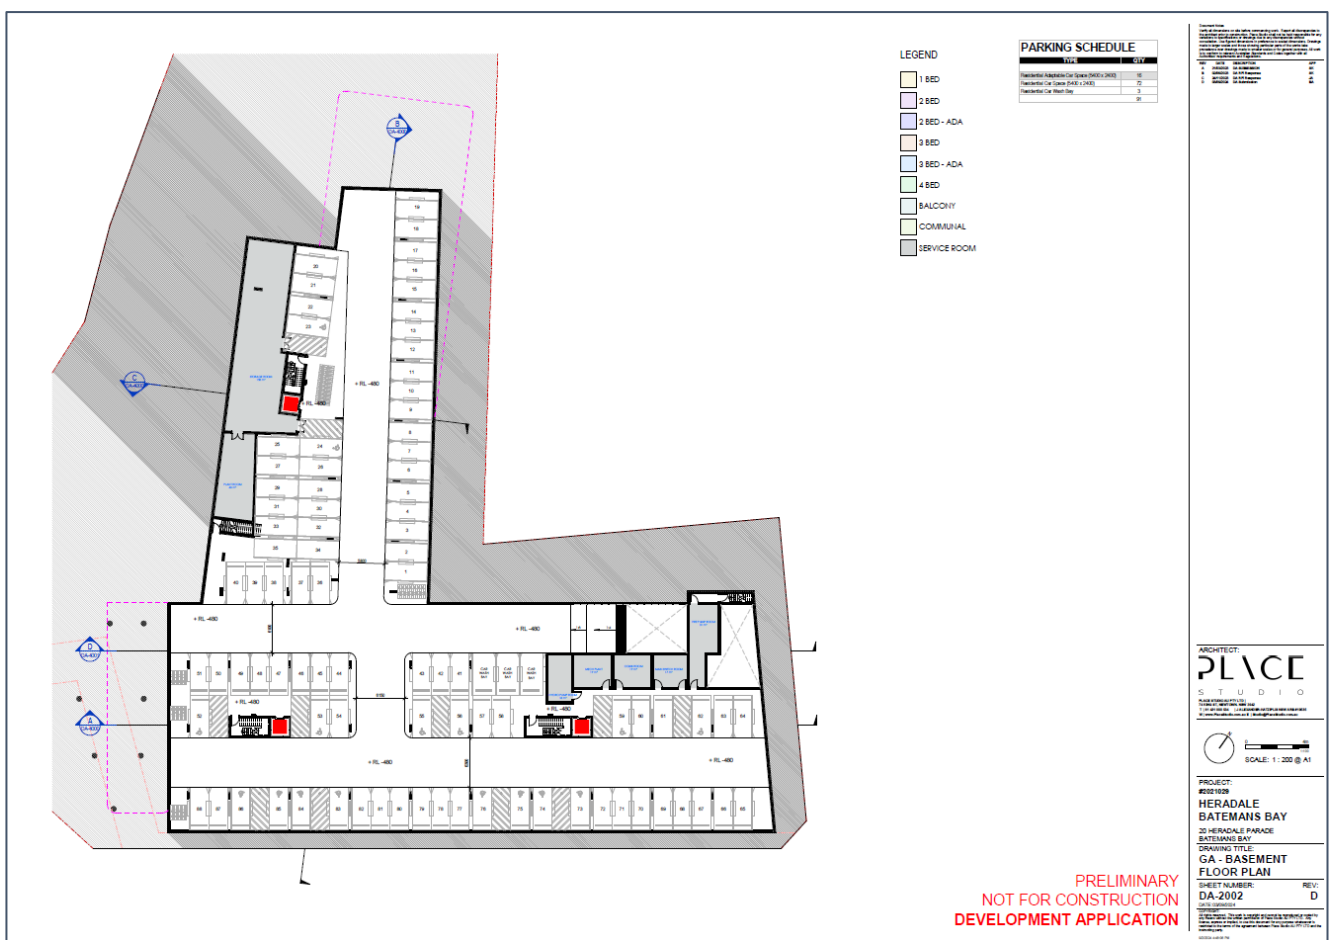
DA0593/23 approved basement floor plan (Source: Place Studio AU Pty Ltd)
